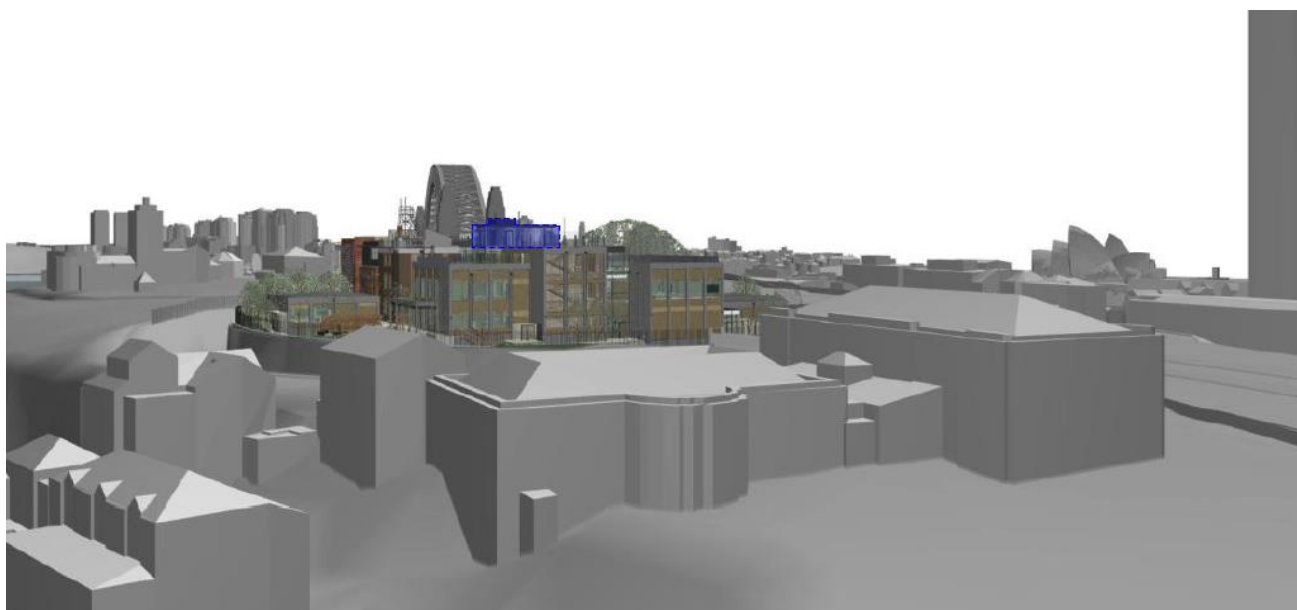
and 7 compare the original Section 4.55 proposal with the amended Section 4.55 scheme.
